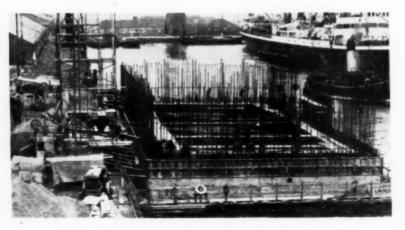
Construction at Tilbury to Height of 52 ft. 6 in.
